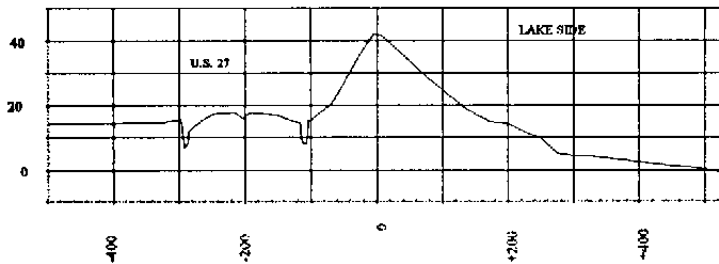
Cross section MRR3-A. Distances and elevations in feet.
